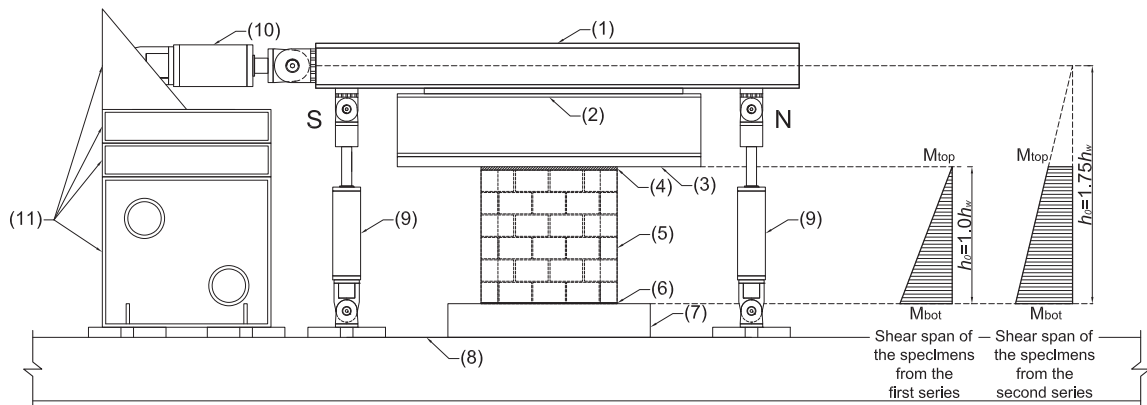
I-shaped URM wallettes with a soft layer bed joint: drawing of the test set-up [57]
